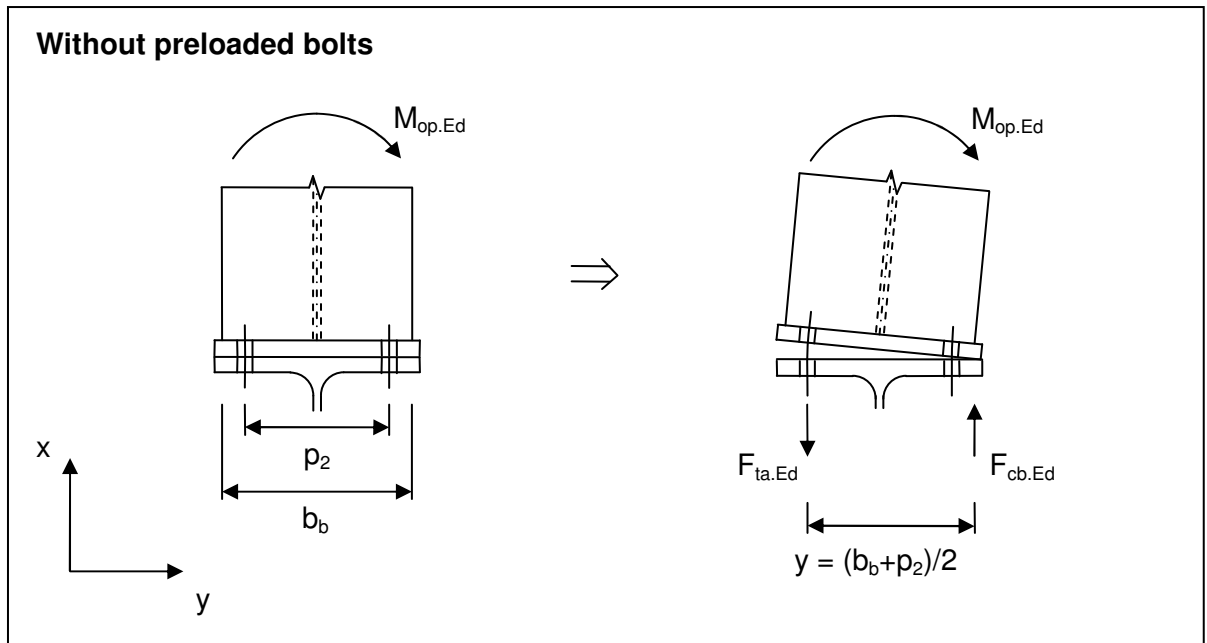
Centre of compression for out-of-plane bending, bolt-lines inside beam – low stiffness in bolts relative to column flange
